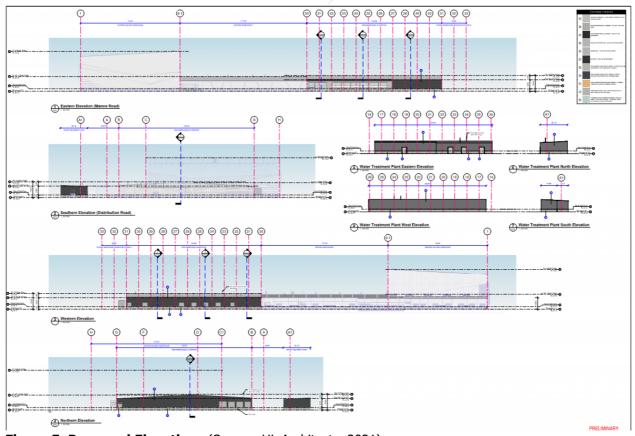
Proposed Elevations (Source: HL Architects, 2021)
